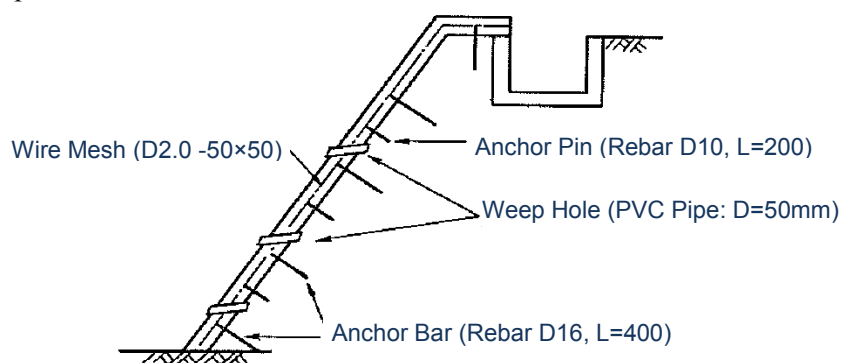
EXAMPLE OF MORTAR/CONCRETE SPRAYING (SHOTCRETE)
